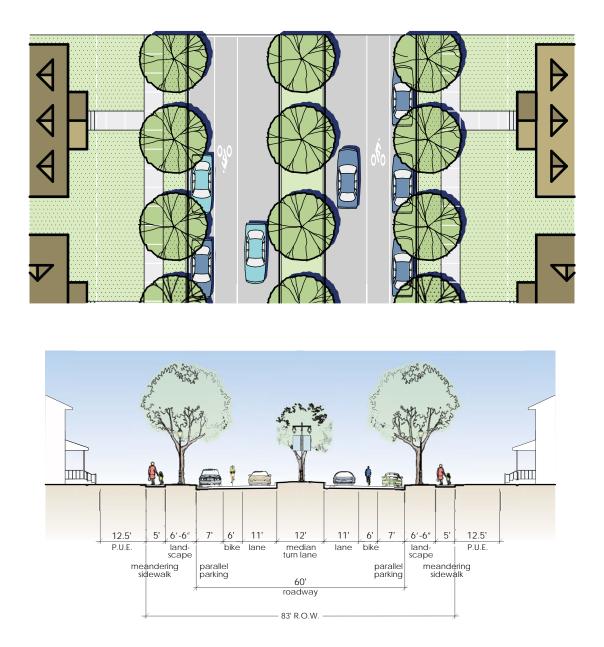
Promenade (Connecting the Town Center to the Village Center) .
